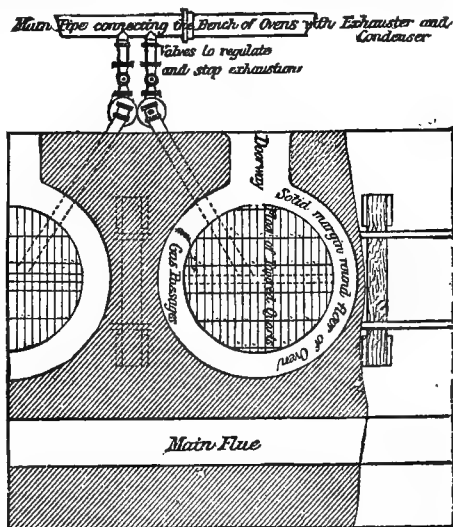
Jameson Coke Oven—Sectional Plan.
